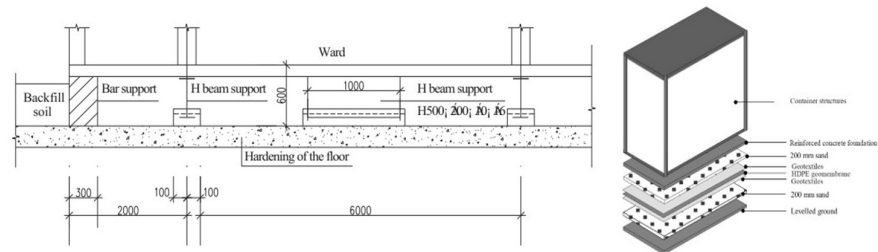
Foundation layout of a typical area of the ward nursing unit in Leishenshan Hospital (Chen et al., 2021) (left) & Typical structural build-up displaying the foundations' HDPE anti-seepage layer (Zhou et al., 2020) (right)
